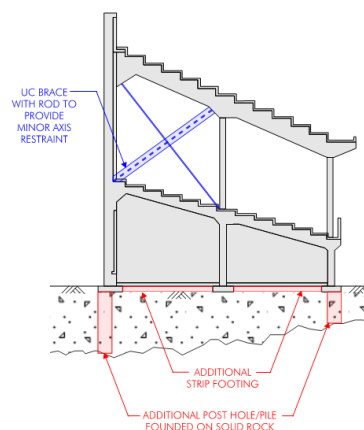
Brace Upper Tier to Lower Tier via Steel Braces: Grid Varies
